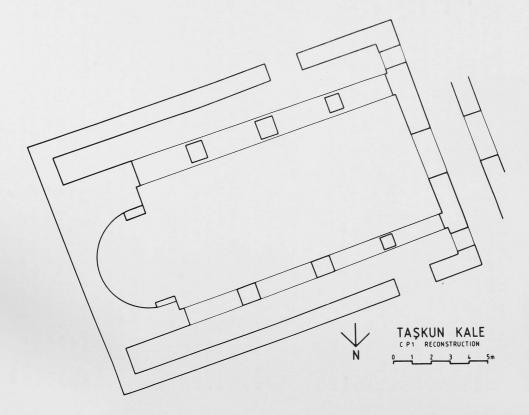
Restored plan of CP 1 basilica, with alternative locations for west wall
